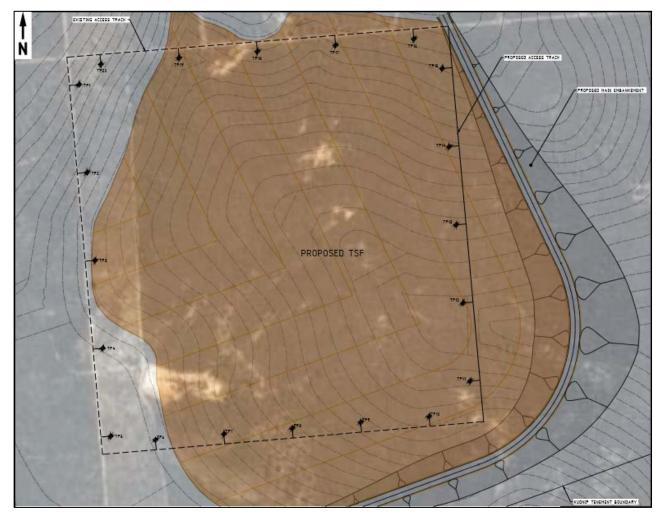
Proposed TSF footprint with associated Test Pit locations.
